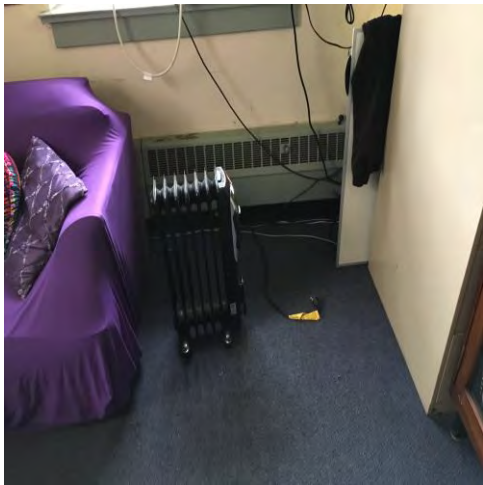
View of carpet over non asbestos tile, plywood and VAT on 1st floor. VAT
